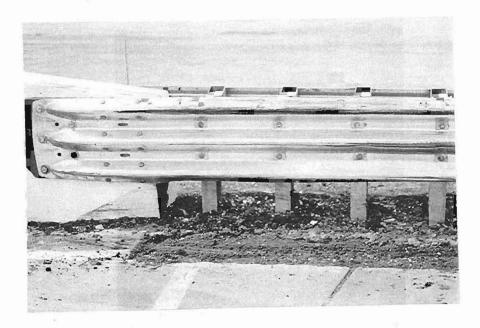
Transition Damage, Test MTSS-2 MTSS-2
